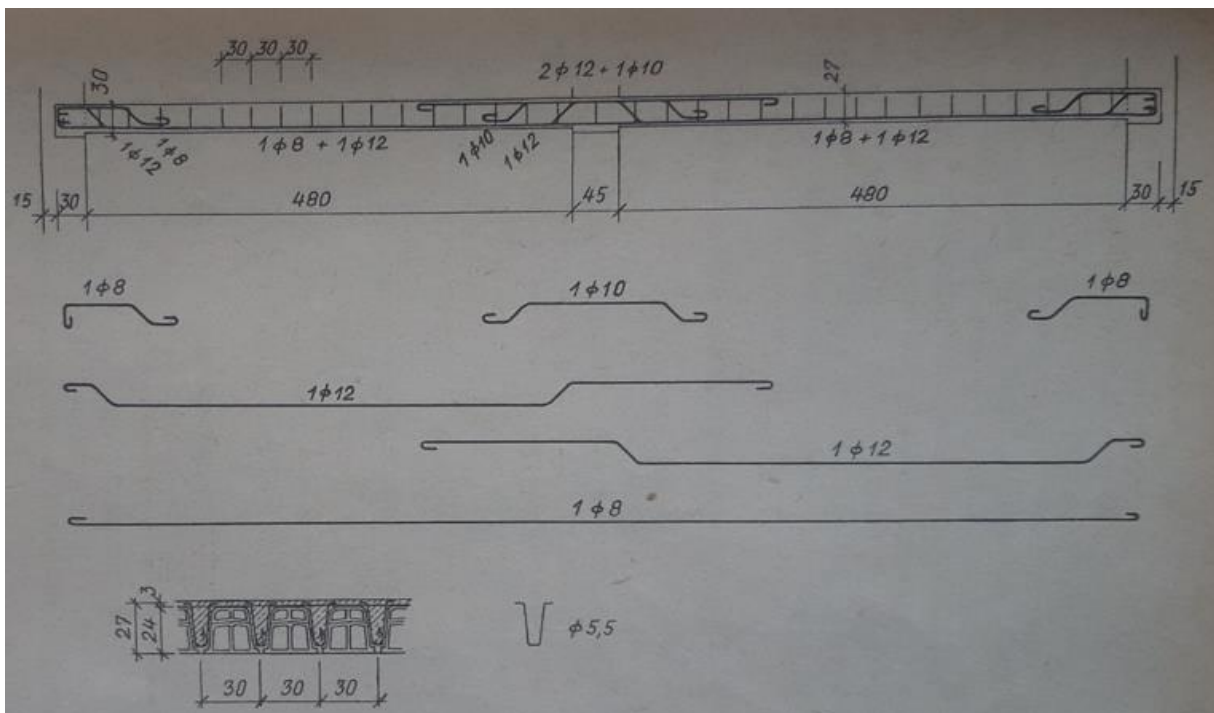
Typical composite slab reinforcing details in continuous span condition [17]
